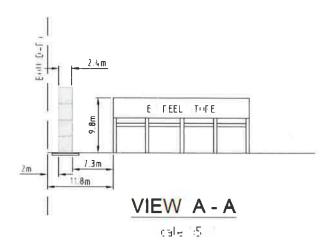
| B7 Reel Store and Proposed Noise Barrier - Relationship with site boundary
